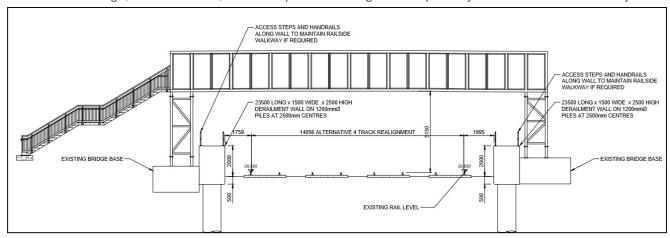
Option 1 - Bridge retained with derailment blocks installed to front of supports
